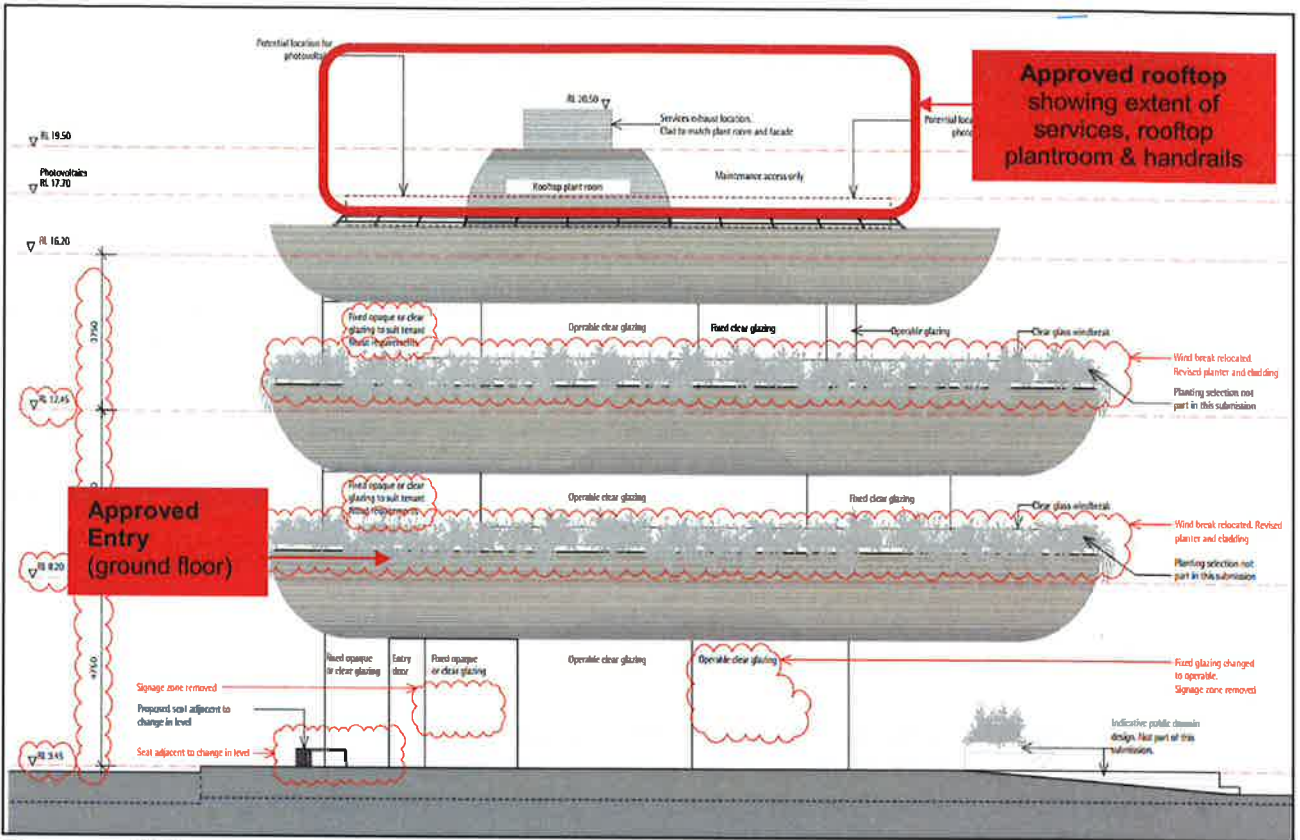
Approved Northern Elevation (Source: Department of Planning and Environment SSD 6513).
